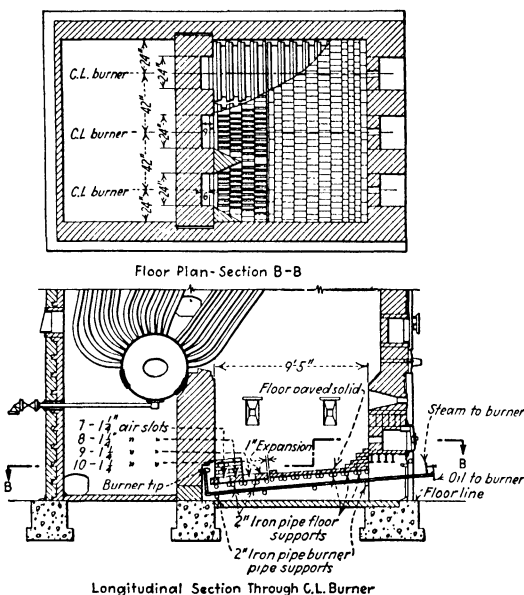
Flat-flame steam-atomizing oil burner installed under a 3,000-sq. ft. bent-tube boiler. (*Hammel Oil-Burner Equipment Company, Inc.*)
